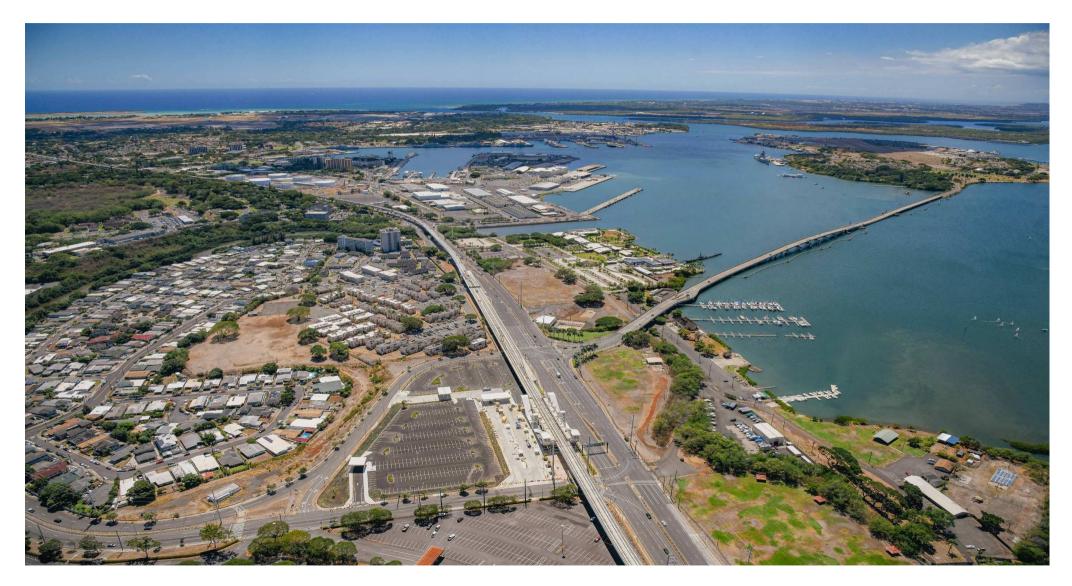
HALAWA ALOHA STADIUM RAIL STATION SITE
